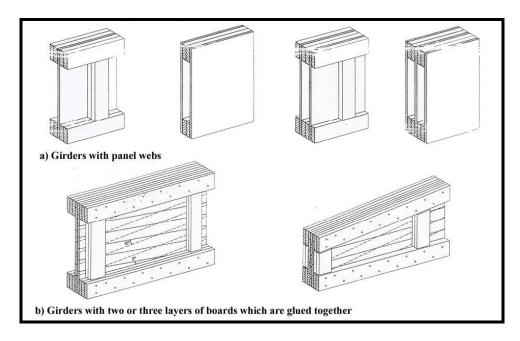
Girders are composed of 'I' or box sections with panels or with glued boards (Götz *et al.*, 1989:57).
